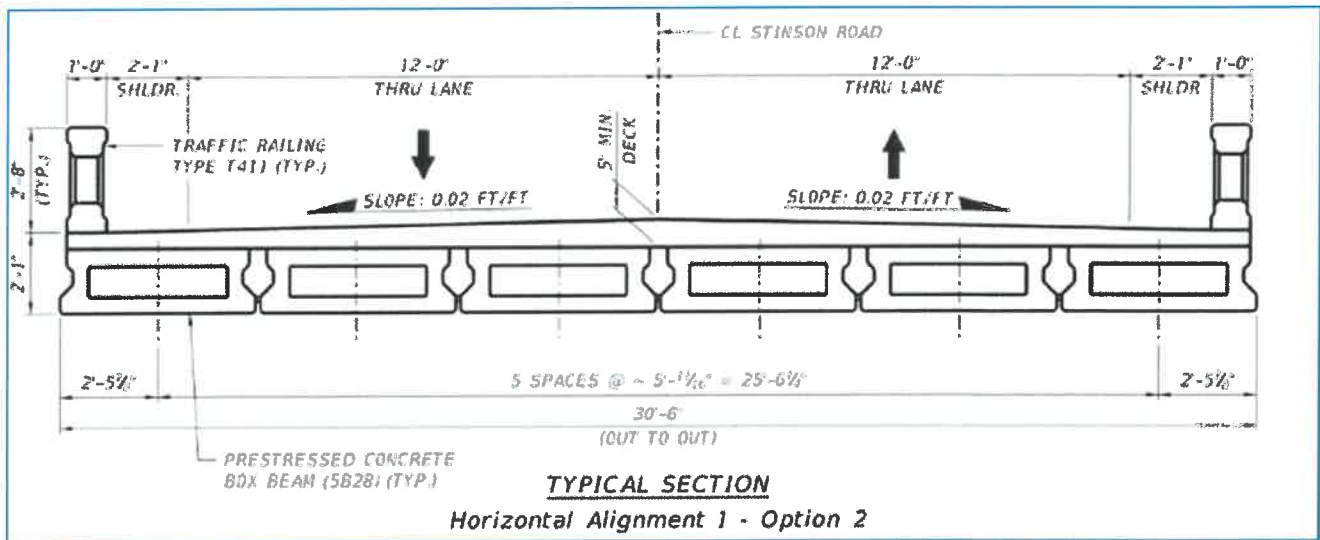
TxDOT Prestressed Concrete Box Beams (5B20) Typical Section
